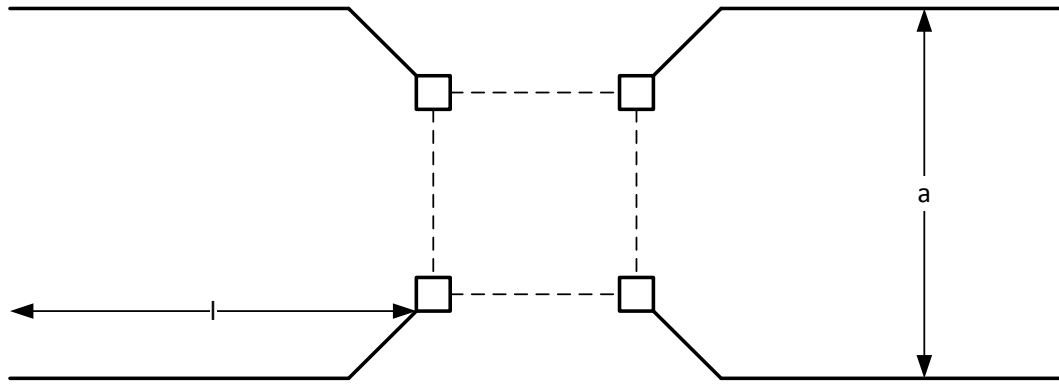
Counterpoise earthing arrangement of a transmission tower
